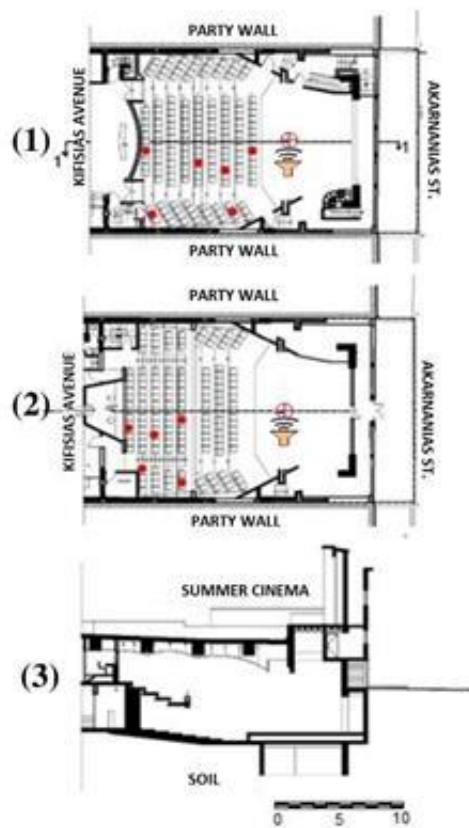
Anesis Theatre. 1: Theatre plan, 2: Stalls' plan, 3: Long section,
